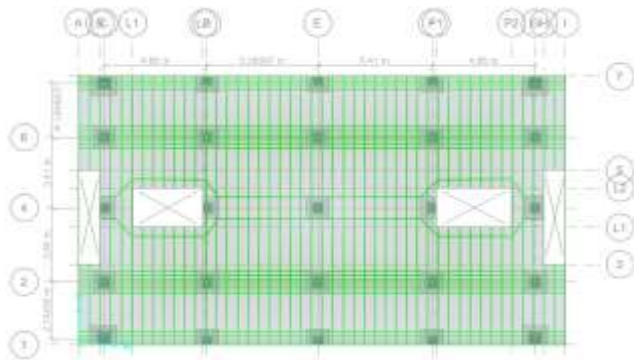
Tendon layout of residential building for post tensioned flat slab with drop
